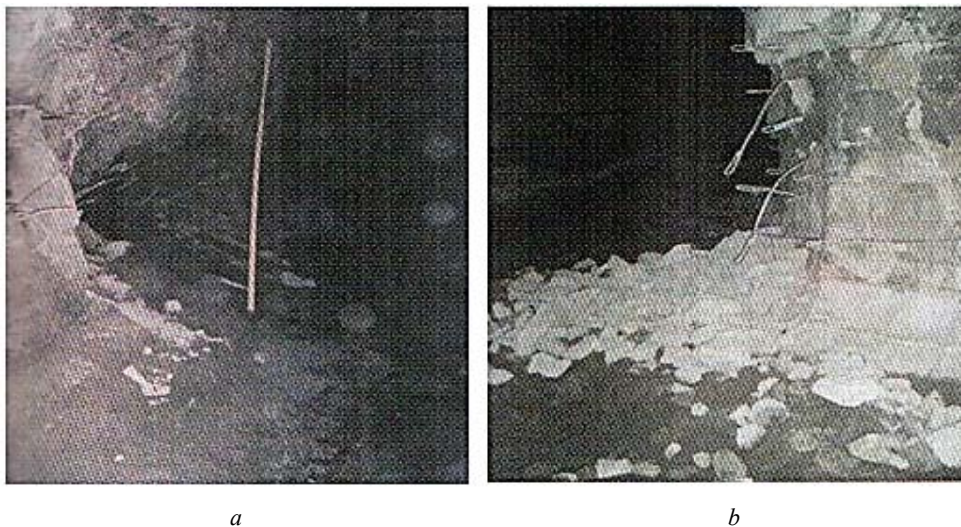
Final stage of destruction of the filling mass in the wall of the working:
